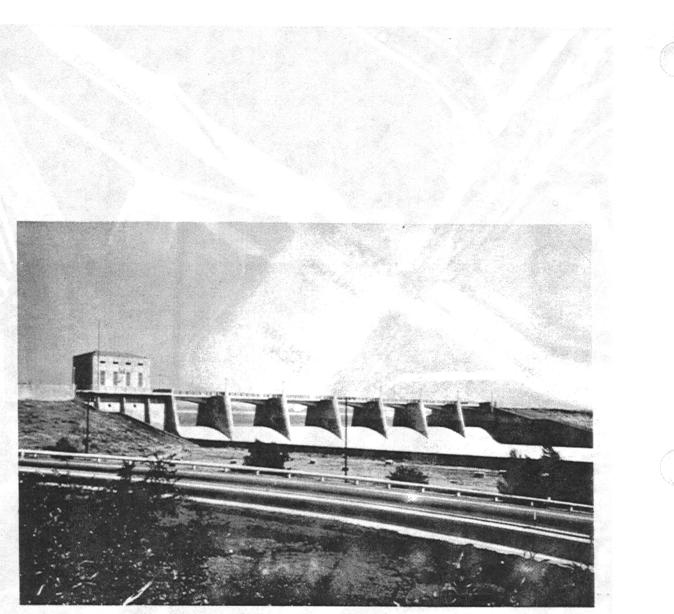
Sepulveda Dam, with Control House (left) and Spillway (view from downstream, along Ventura Freeway).
